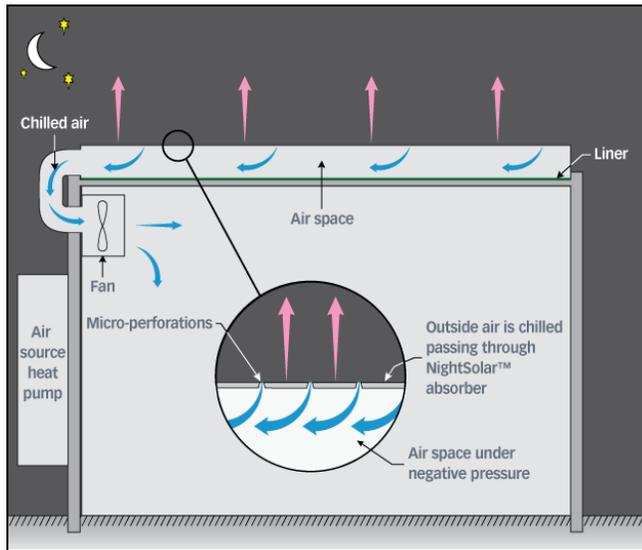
Typical flat roof installation connected to fan or HVAC unit with economizer cycle
